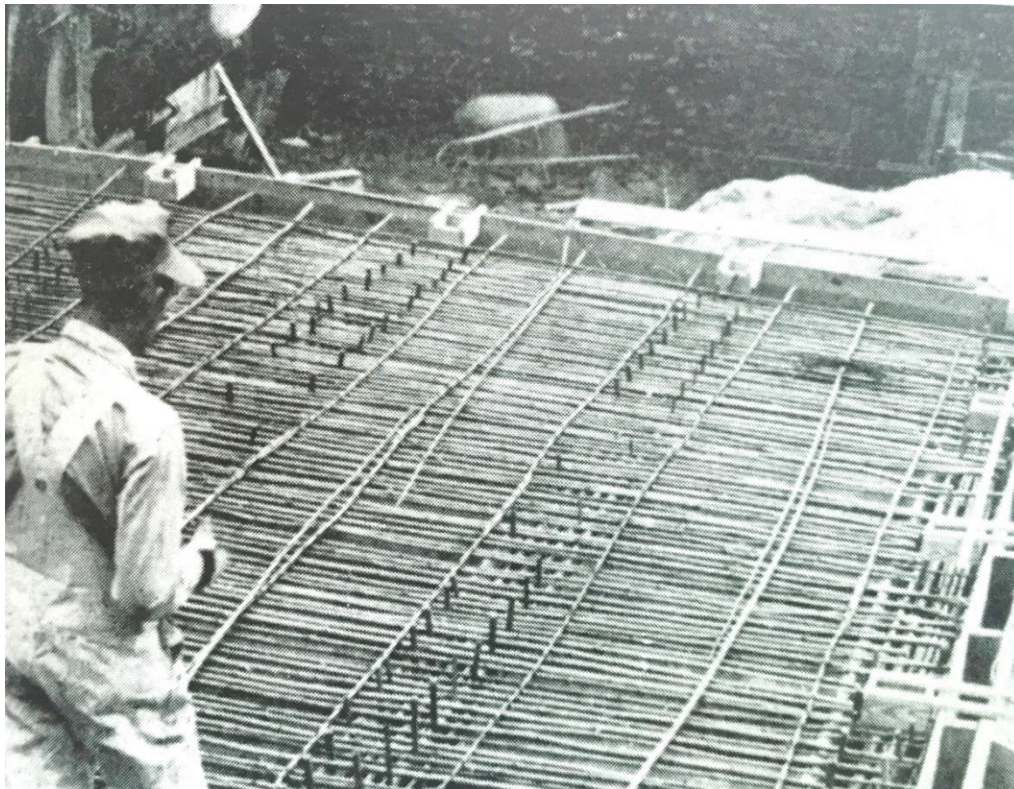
Small diameter bamboos used for reinforcing concrete beams and slabs in the Press Box Building in Clemson (Hidalgo-Lopez 2003)
